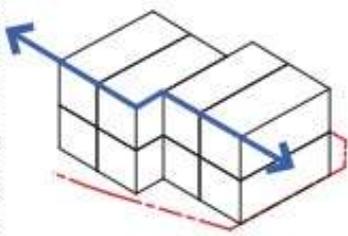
The articulation and broken forms of 82 Wentworth Park Road prevent it from looking monolithic unlike the proposed building – see Figure 7 below
